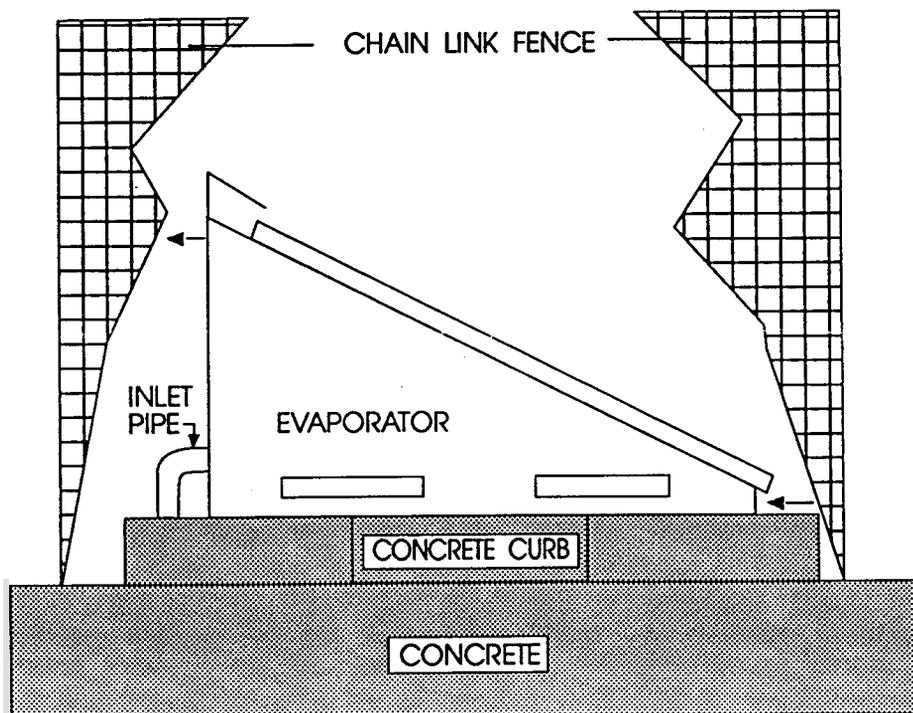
FIGURE : ELEVATION VIEW OF EVAPORATOR INSTALLATION
